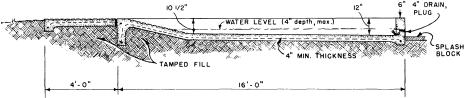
Concrete hog wallow. (Plan Exchange No. 5842.)
